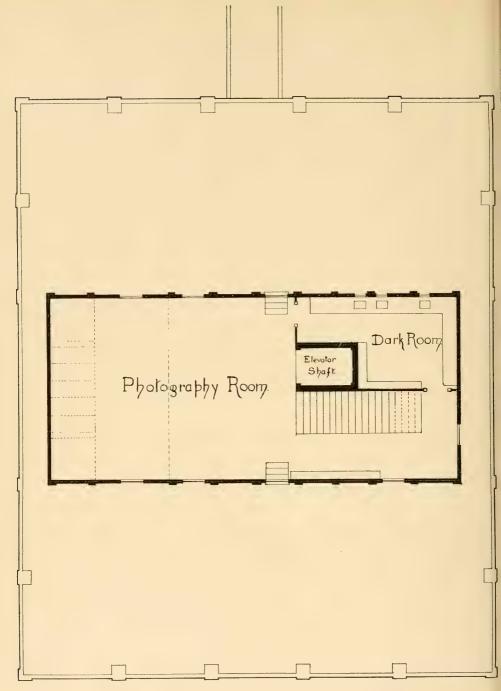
ROOF AND PHOTOGRAPHIC DEPARTMENT.
